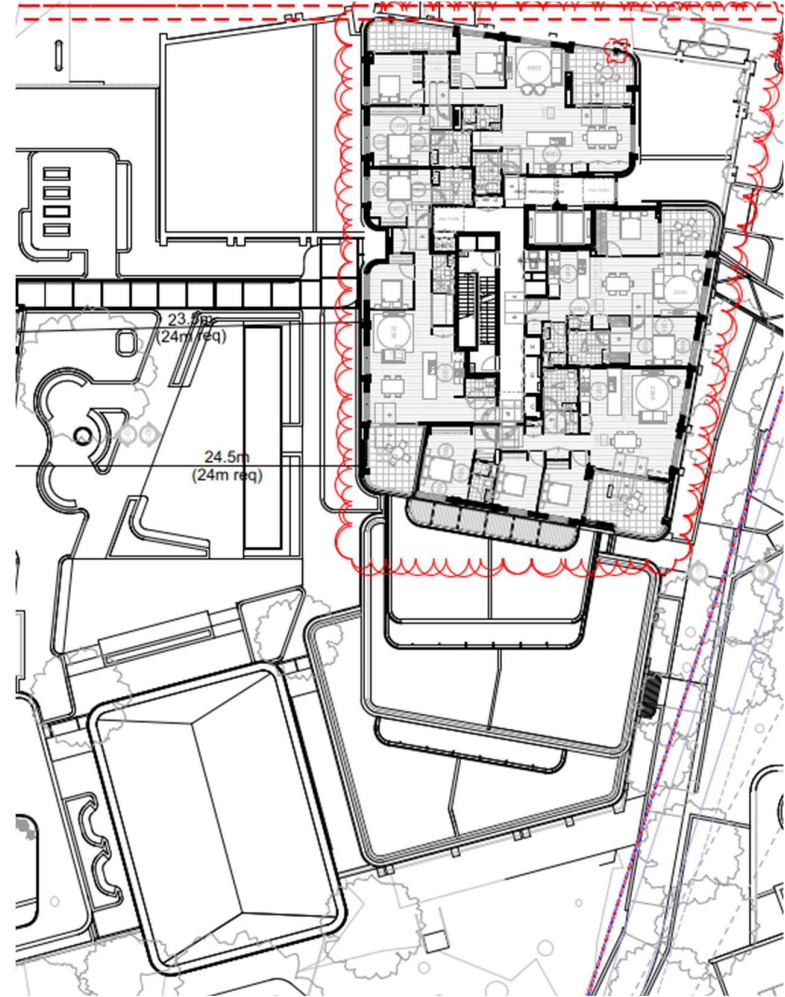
Approved and Proposed Level 11 of Building B (2 of 2)
